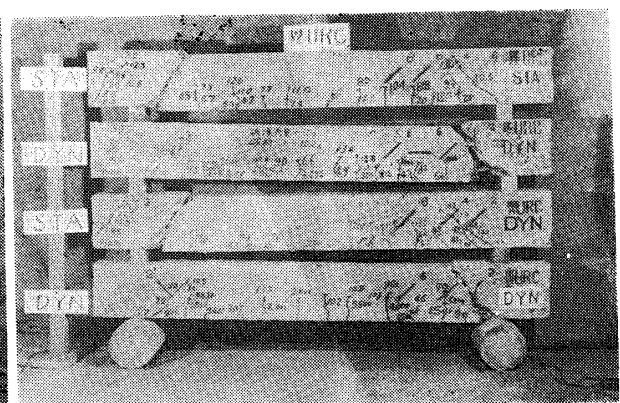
a Left side crack of URC deformed steel bar beam Photo.4 b Right side crack of URC deformed steel bar beam
